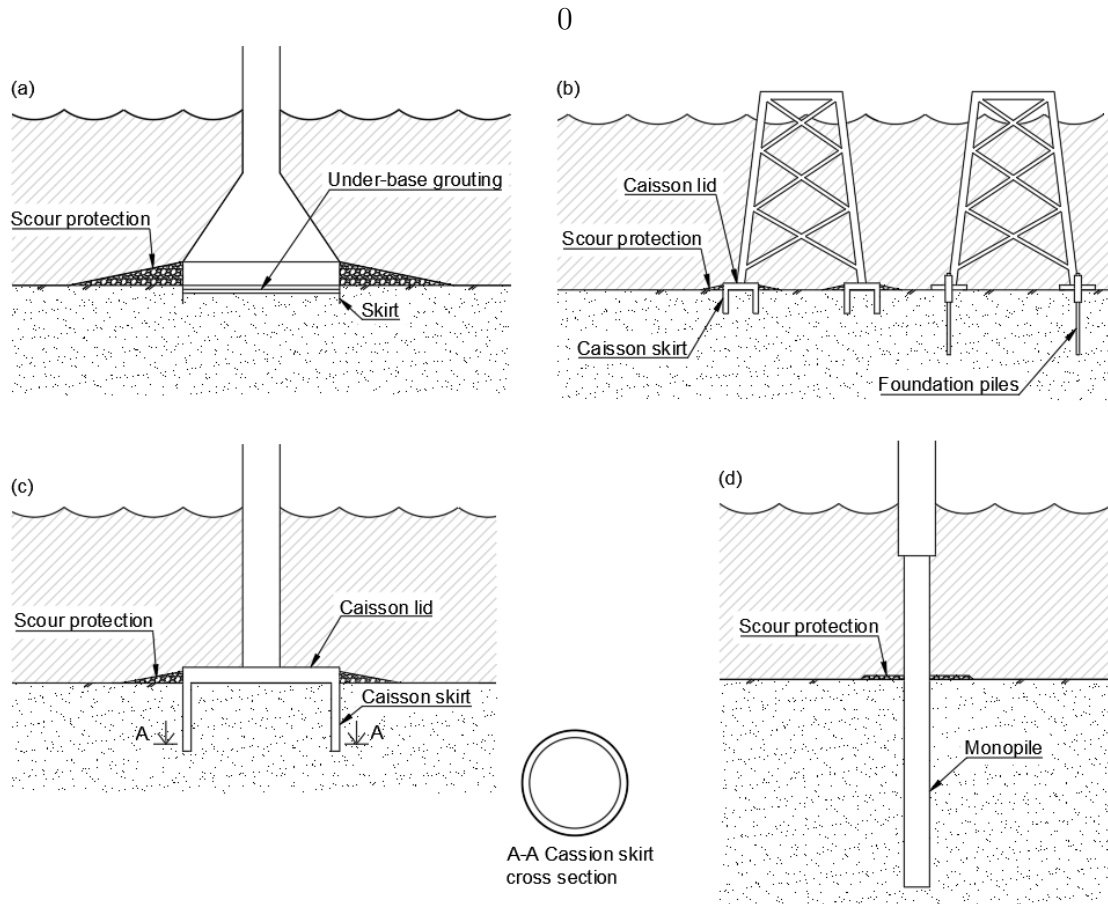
Foundation types for fixed substructures: (a) shallow foundation, (b) from left: suction caisson and foundation piles, (c) suction bucket and (d) monopile foundation.
